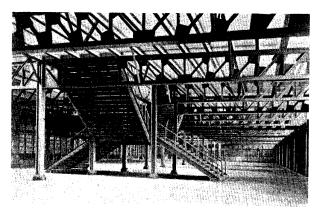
$K\bar{o}be$. Interior of Shed "O" on Pier No. 4 (Reference 8).
